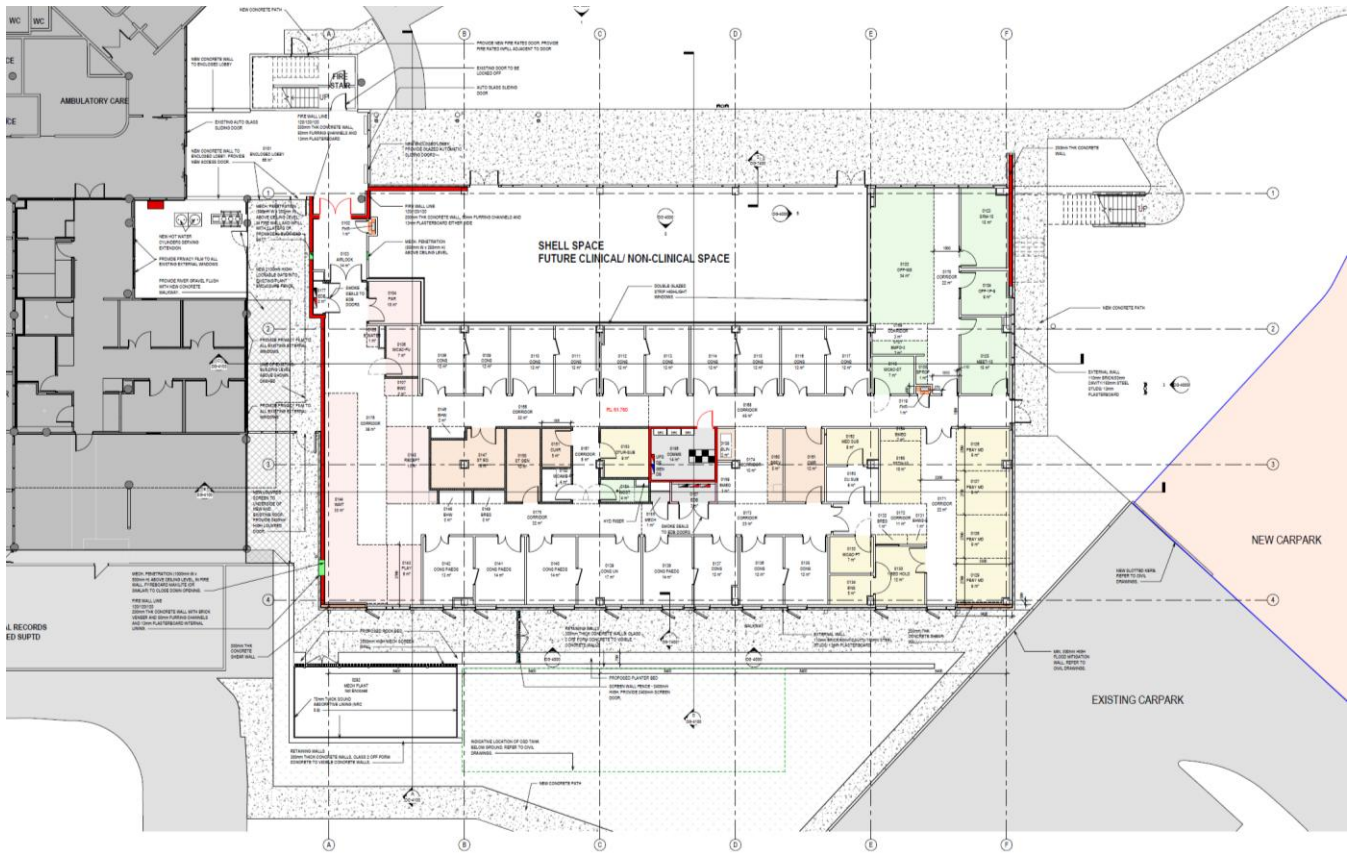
Level 1 General Arrangement Plan (Jacobs)
